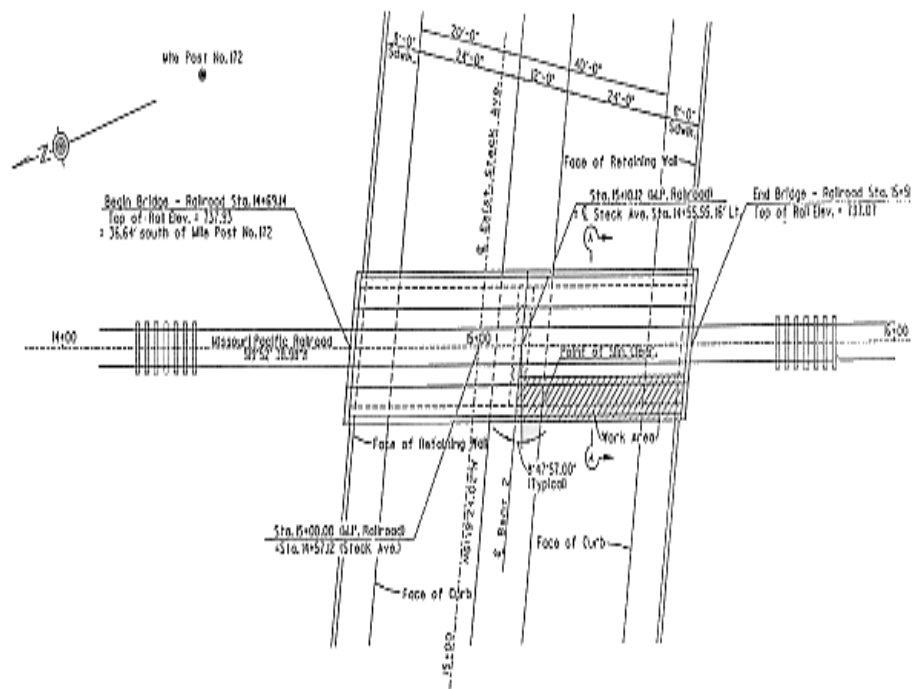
Plan View of Mopac Structure over Steck Avenue in Austin, Texas
